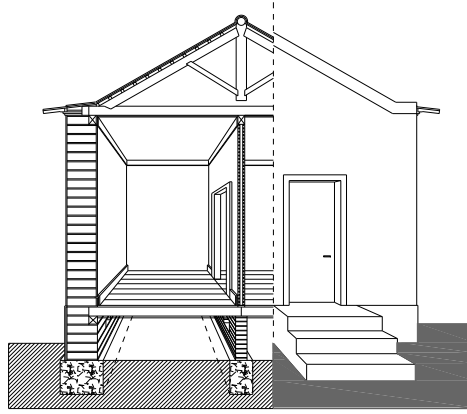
Scheme of earth (adobe) construction system with ventilation space below [credits Alice Tavares]
